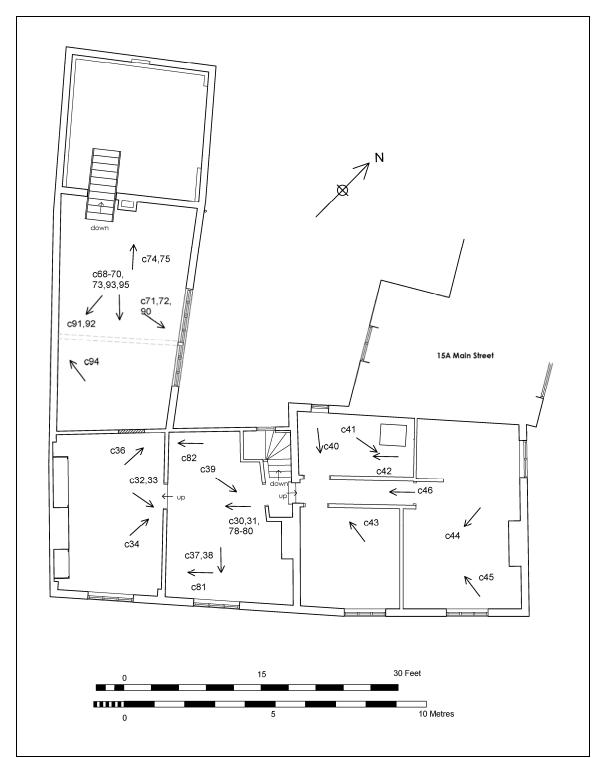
Location of photographs of 15 Main Street, first floor held in archive
